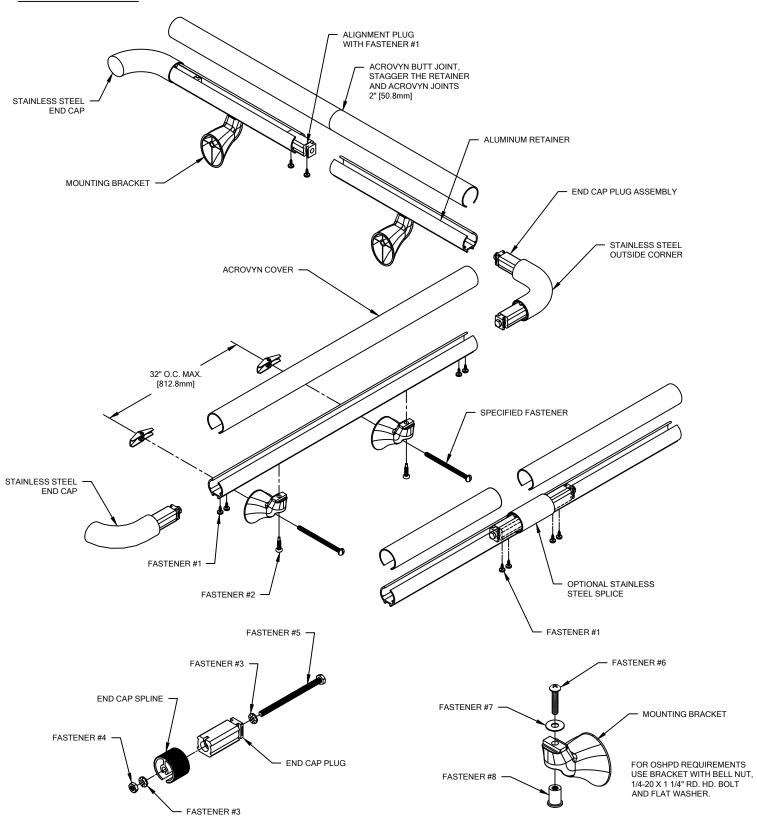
END CAP PLUG ASSEMBLY FIGURE 2.
